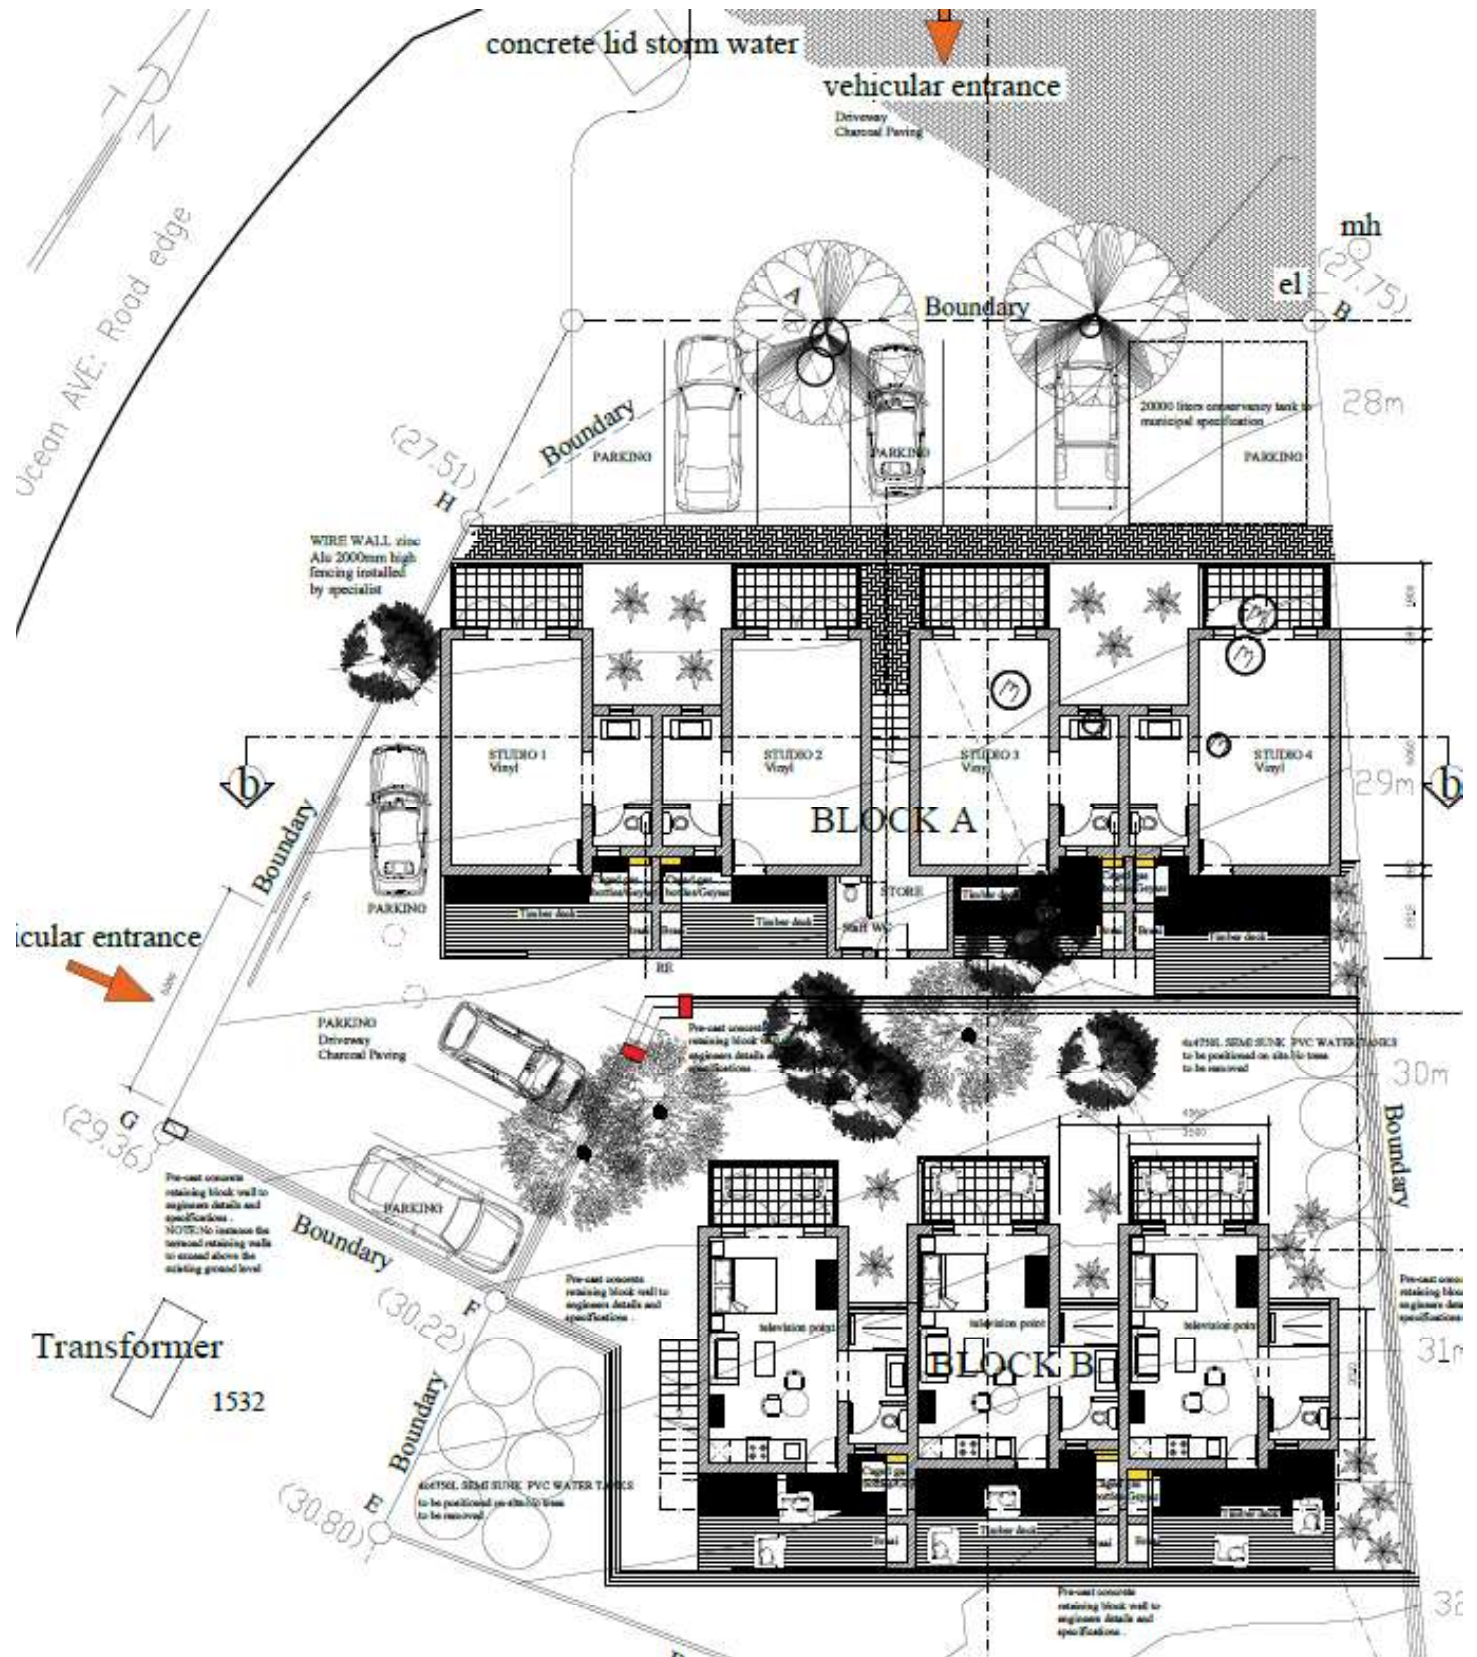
PROPOSED GROUND FLOOR PLAN.
